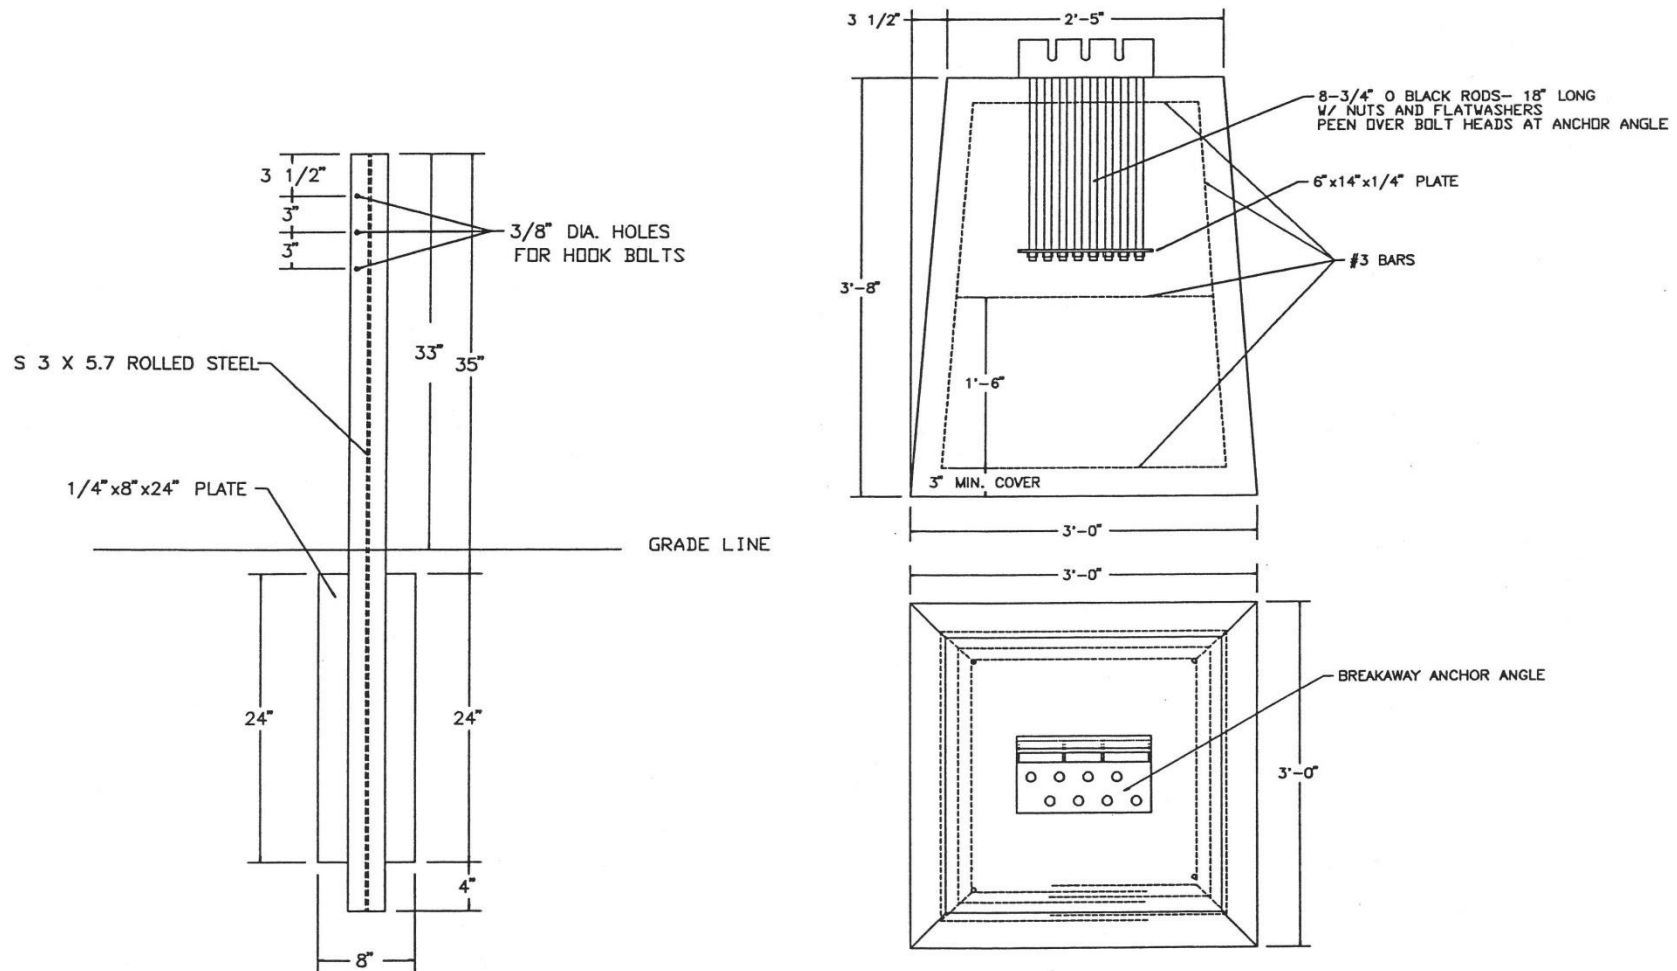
Line Post and Anchor Block Details, G1 Guardrail System, 1994 [51]
